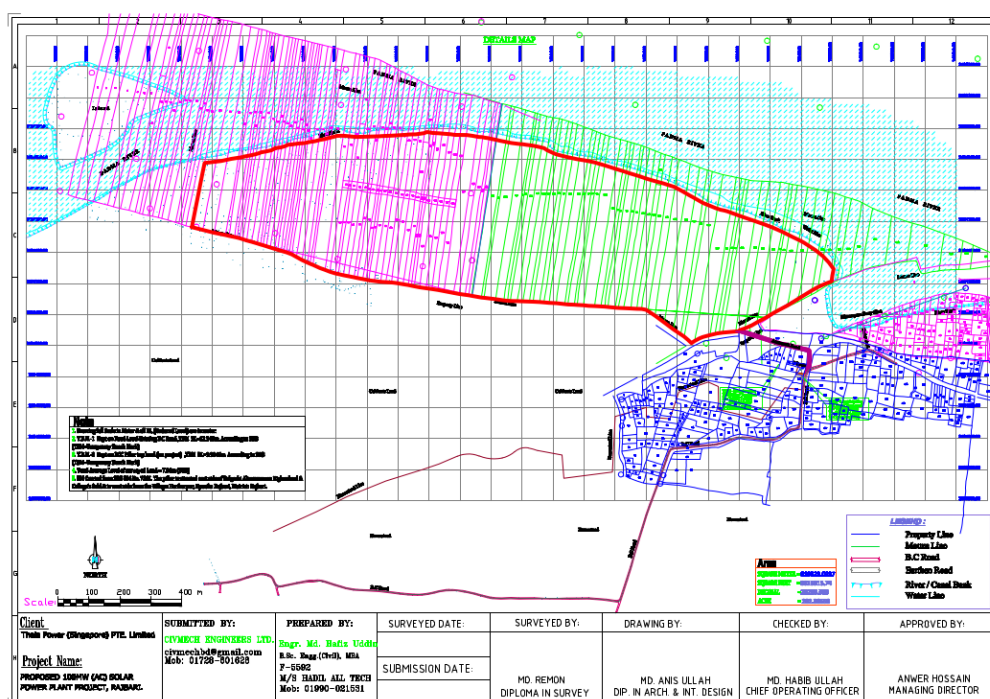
Detailed plan and location of the 100 MW Solar Plant
